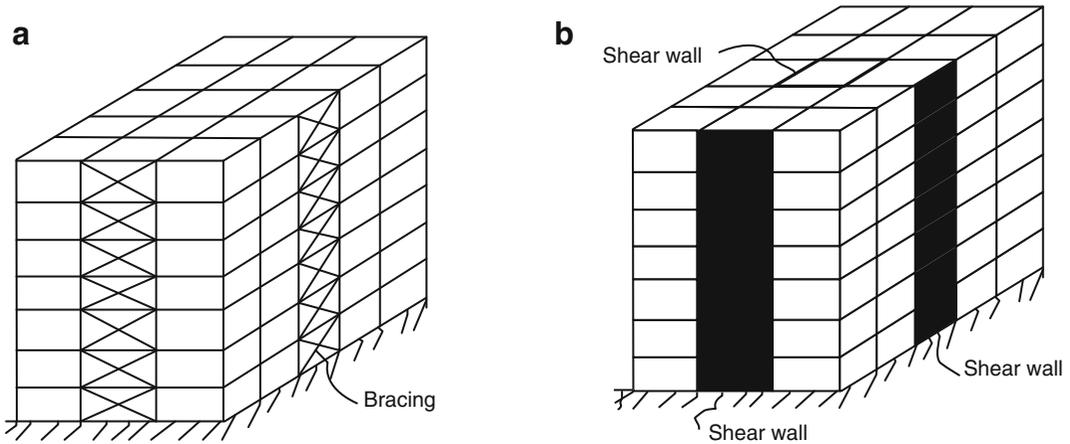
(a) Steel braced frame with bracing. (b) Concrete frame with shear walls
